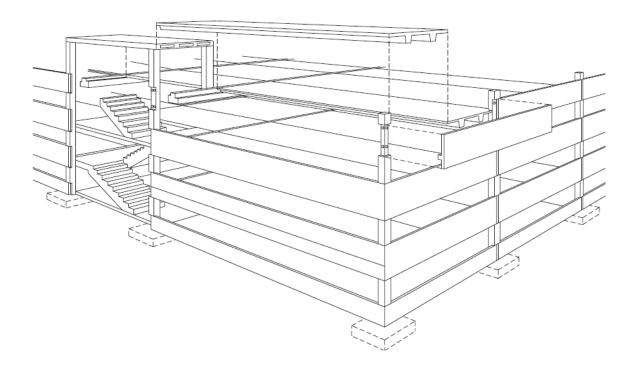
Example Revit Design of the Prestressed Parking Garage (Force et. al., 1997)
